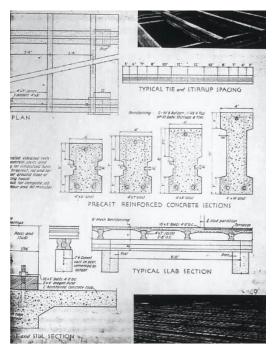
Plans for the precast reinforced concrete sections in the VDL house. (Photograph in *Architectural Forum*, November 1934.)
